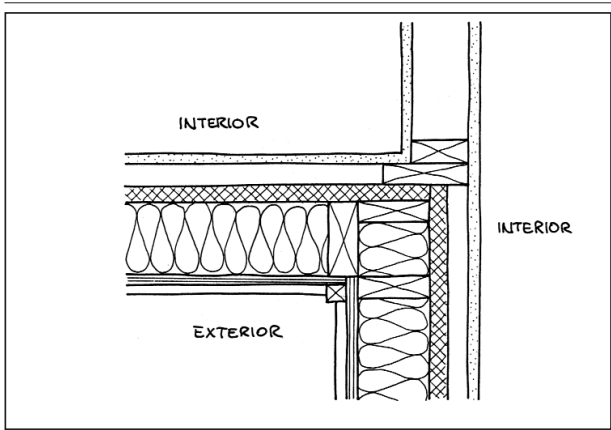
Wall alignment. An inside partition needs to be offset 2-1/2 inches to keep its inside face aligned with an exterior wall.
